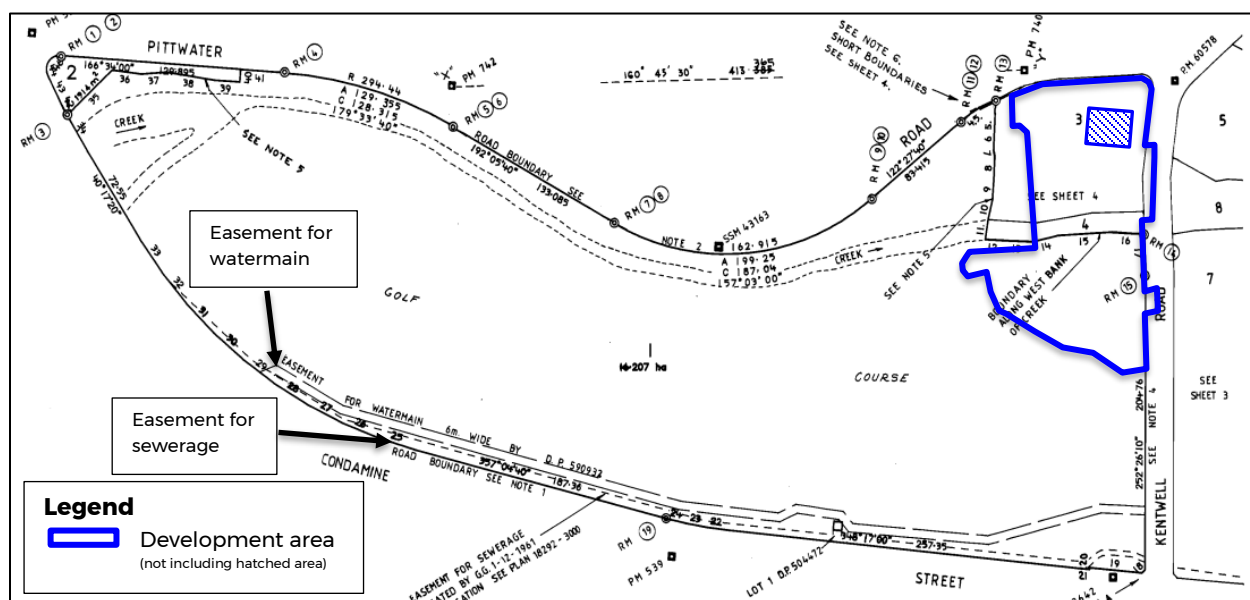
Deposited Plan for the Site (Source: Land registry, 2024)
